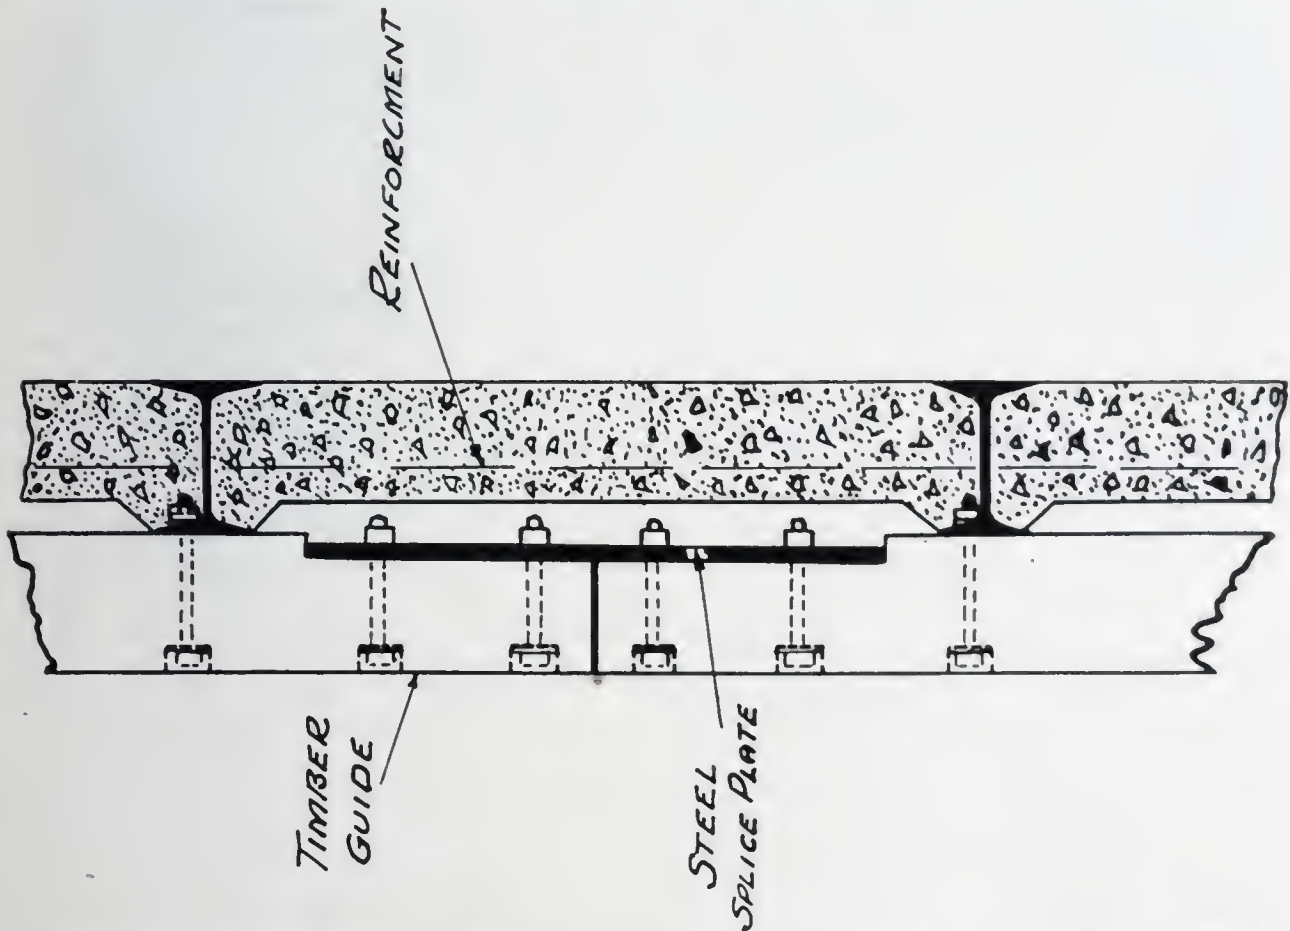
Typical Curtain-Wall Section of Concrete in Panels on Steel Buntions, With Guide Connections.
